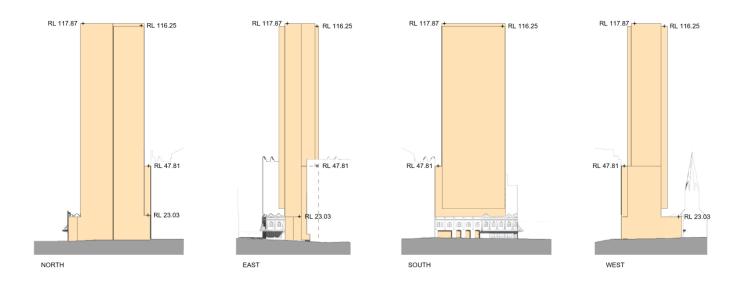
XX 757-763 George Street, Haymarket – Indicative envelope cross-sections
